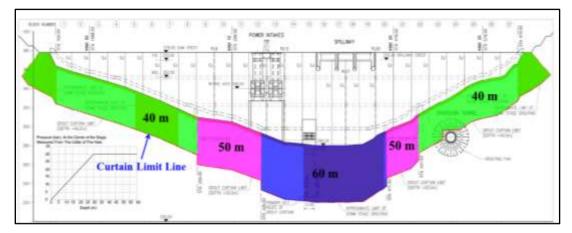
Different grouting depth of curtain grouting at Upper Paunglaung dam
